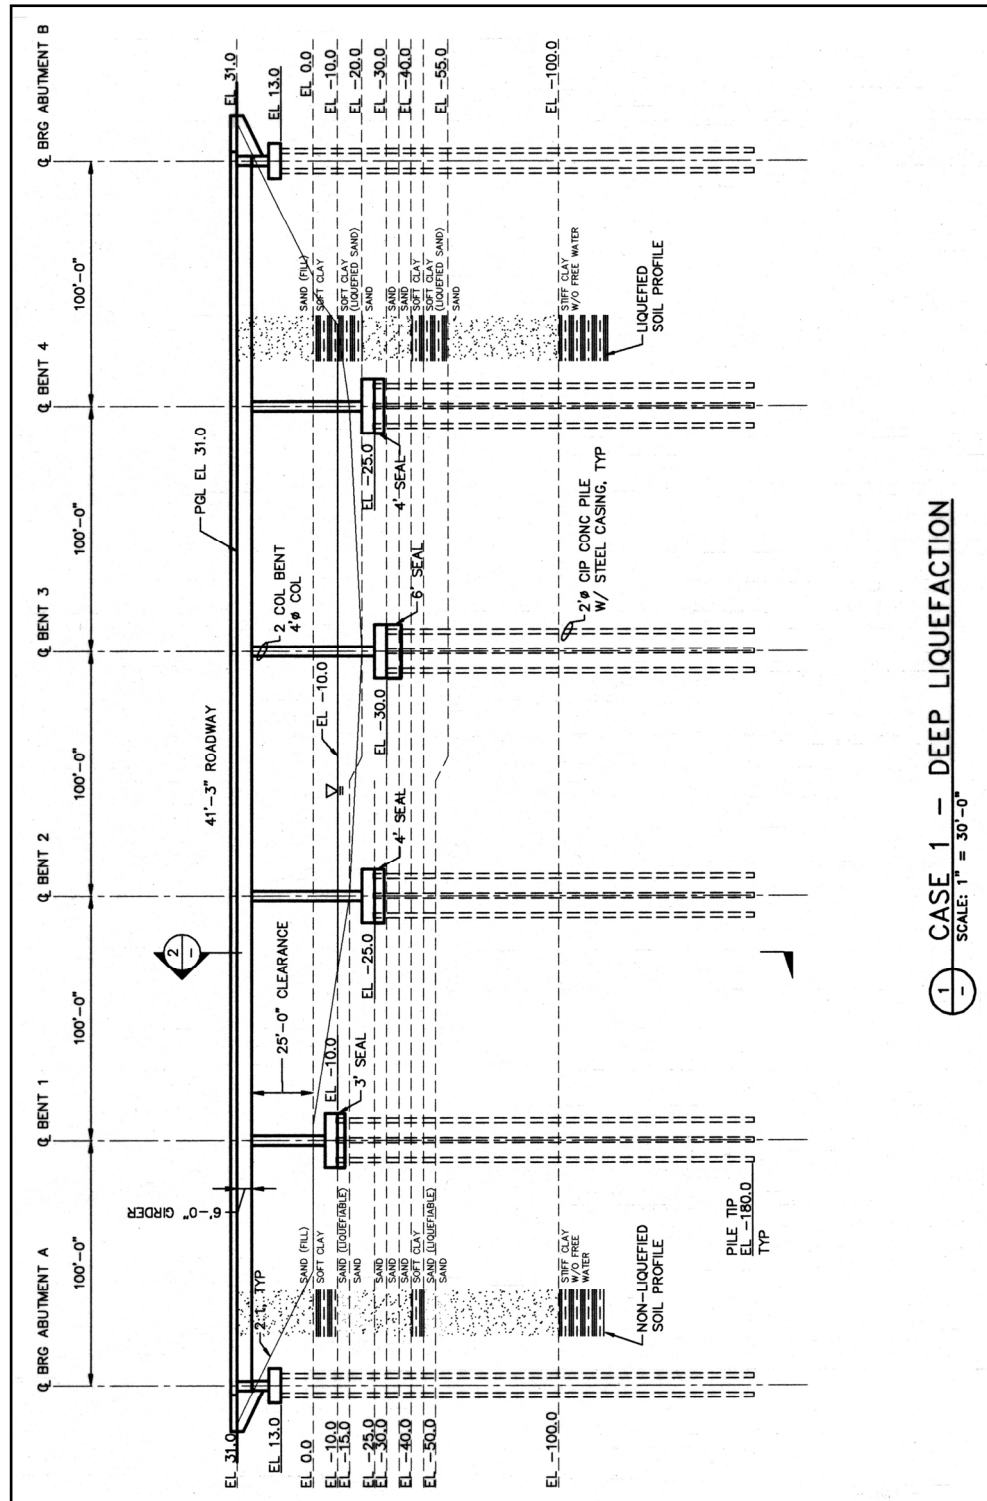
Bridge Elevation Superimposed on Soil Profile
